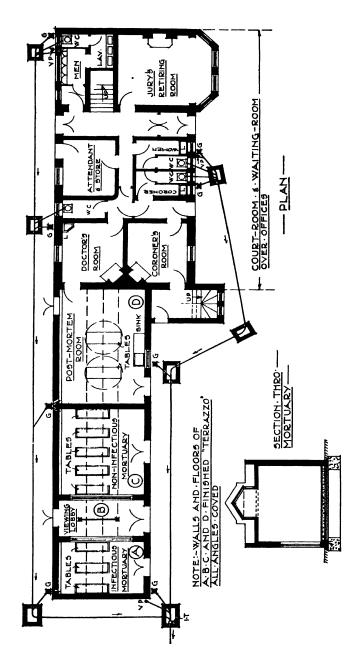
Mortuary attached to a Coroner's Court. Plan showing lay-out and drainage.
